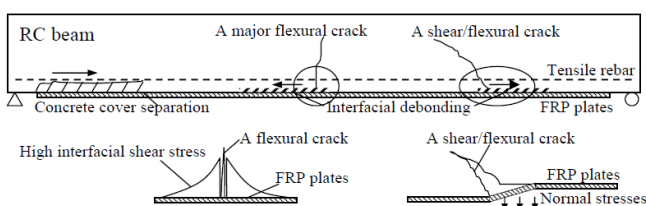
Debonding failure in FRP strengthened concrete beam.
